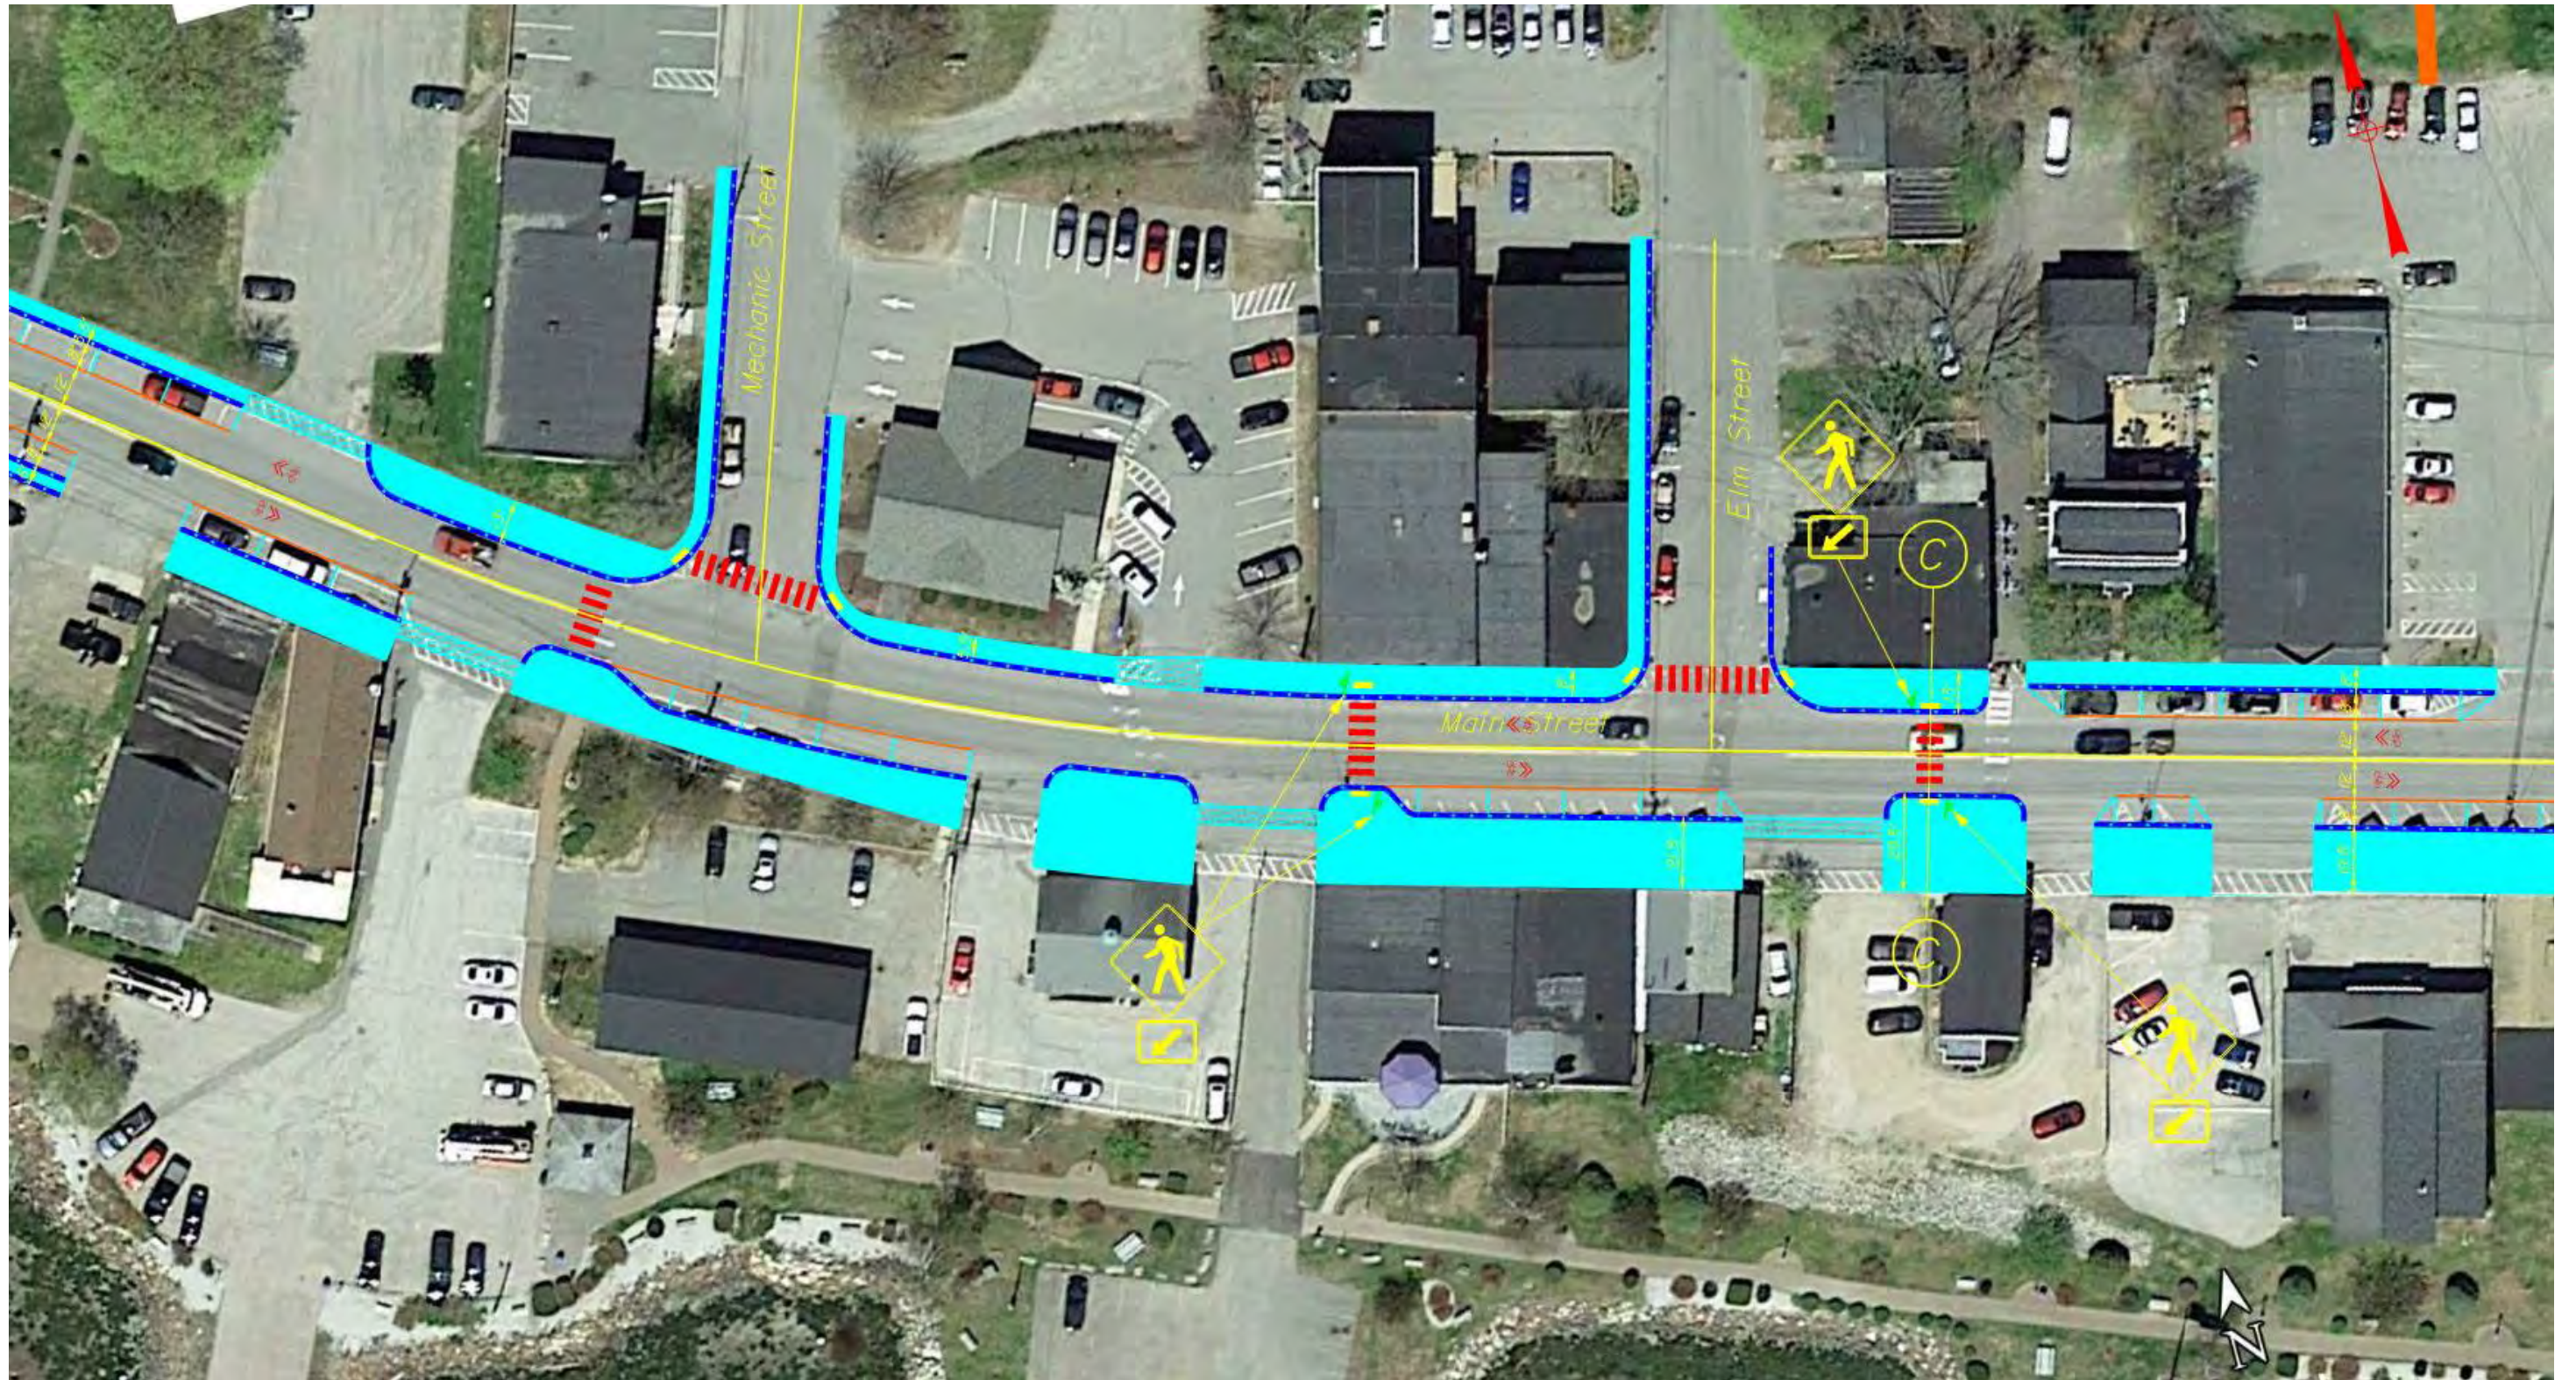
Main Street Improvements from Central Street to Mechanic Street
